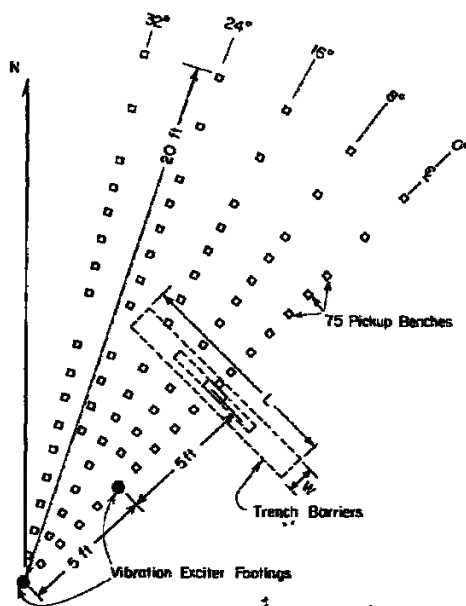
Plan view of field-site layout for passive isolation (from Woods, 1968).
